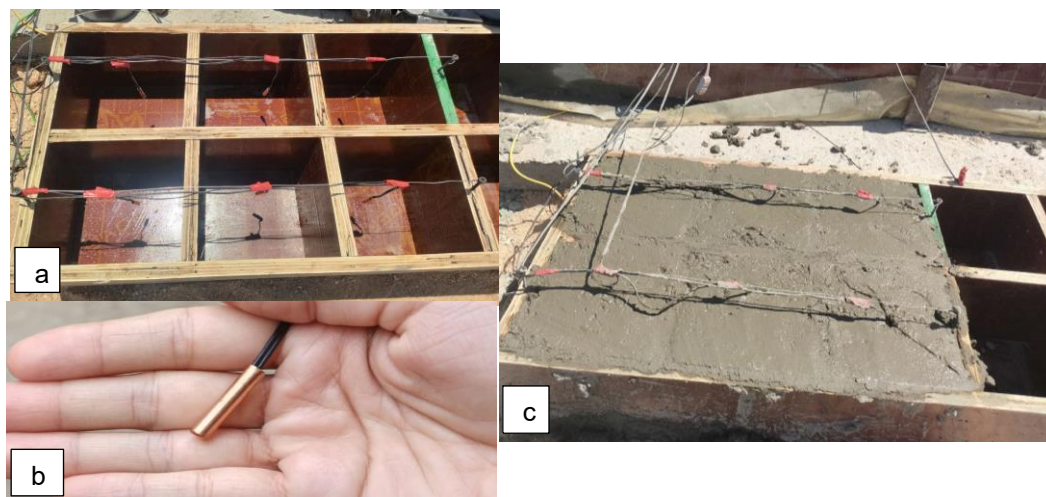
a) The thermistor installing, b) the thermistor, d) after casting.
